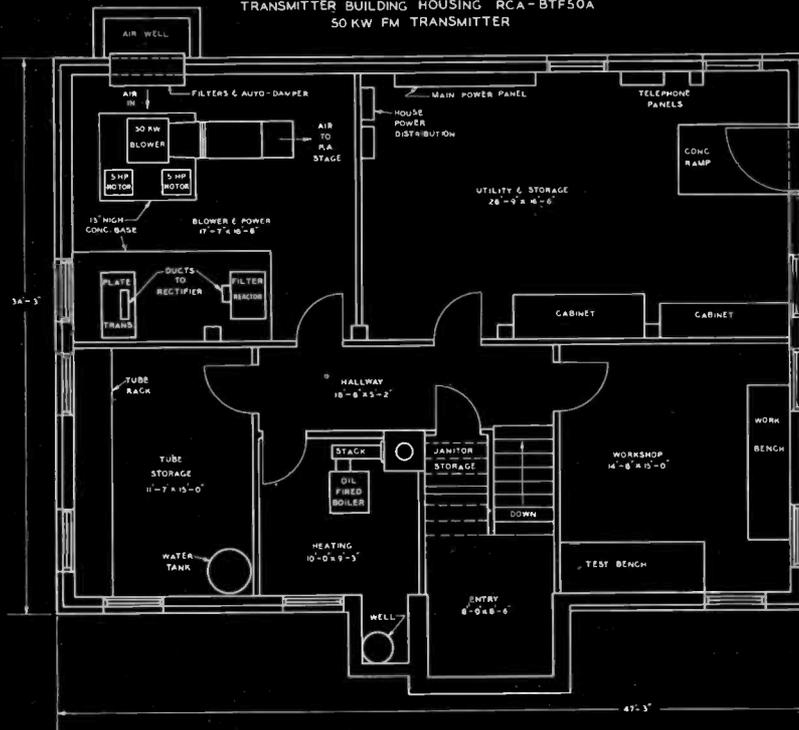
(at top). First floor plan view of WTMJ-FM transmitter building shows location of 50 KW FM transmitter components. Note that doors provide walk-in access to entire transmitter enclosure.
